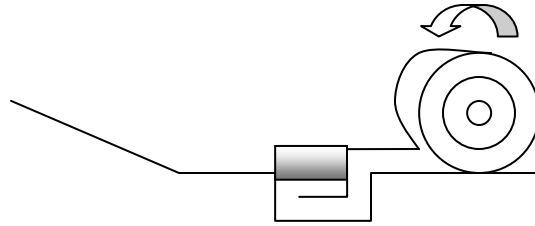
The trench is backfilled and the mat is rolled over the trench creating an anchor.
